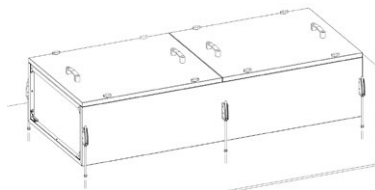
Mounting EVO-T+ in the horizontal working position.
